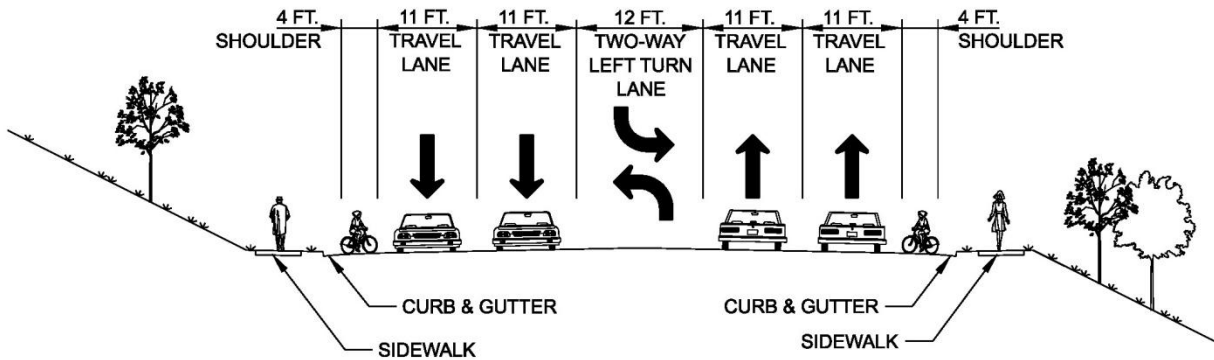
SEGMENT 1 PROPOSED TYPICAL SECTION
